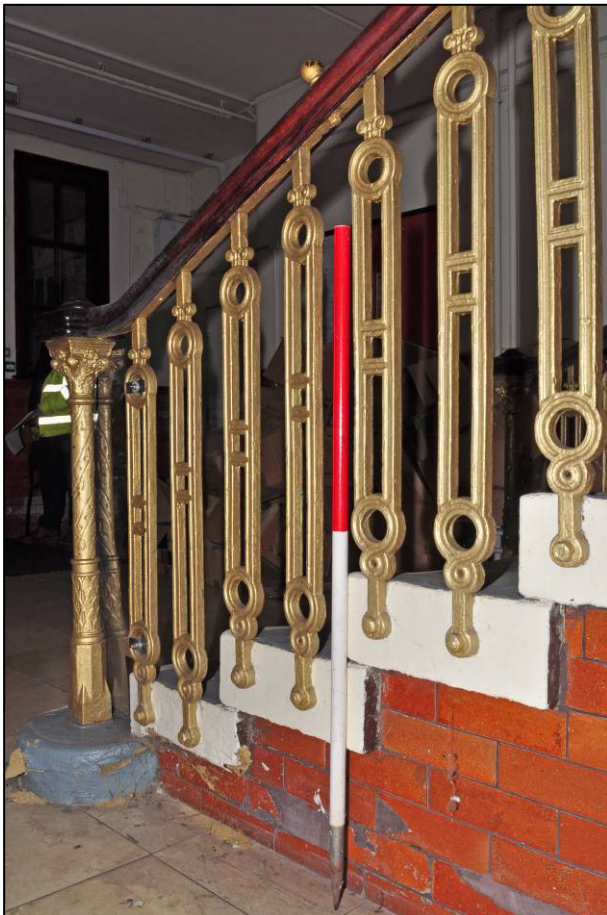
1895 Higher Grade Boys' School, stair hall (GF14), balustrade detail to main stairs, looking N (photo 2206).
